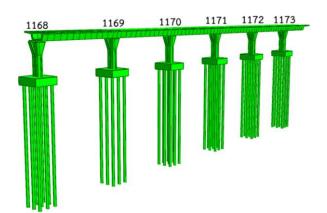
Example for bridge pier in high-speed rail bridge structure modelling in this project for finite element analysis.
